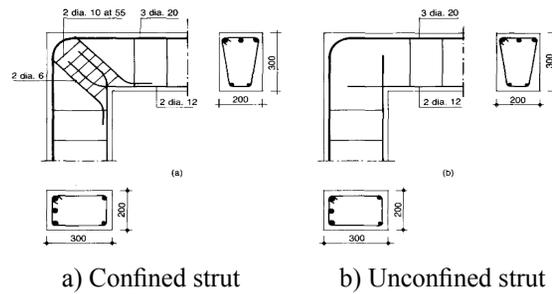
Details for specimens with and without confined strut (Zouzou et al., 1993).
